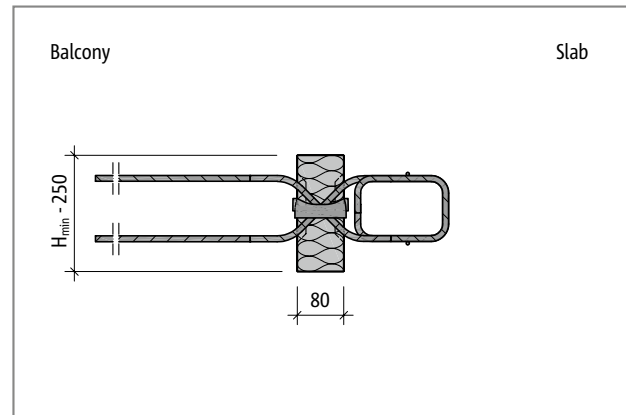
Schöck Isokorb® T type Q-E-W-VV5: Product section
